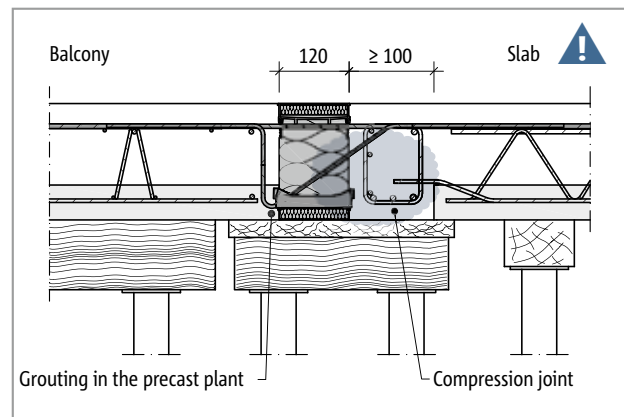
Schöck Isokorb® XT type K: Indirect support, installation in conjunction with element slabs (here:  $h \leq 180$  mm), compression joint on floor side
